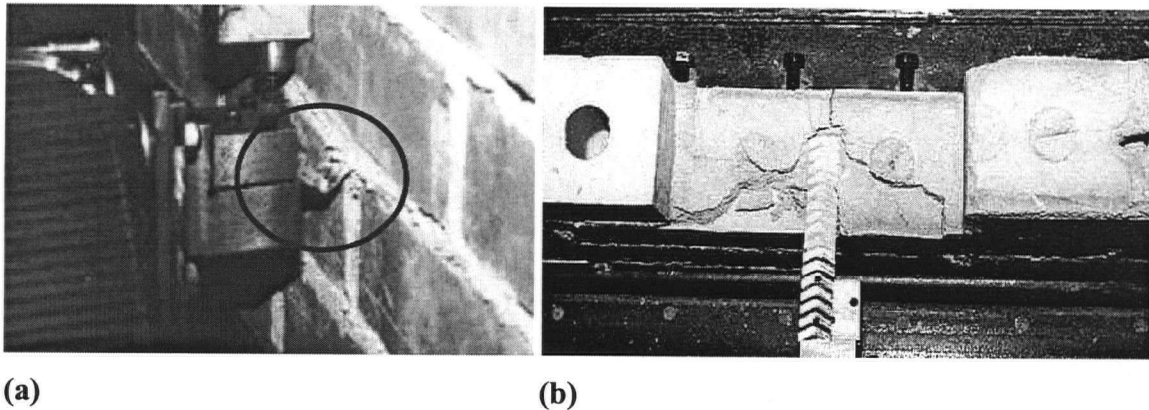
Photograph of failed specimens with corrugated strip tie (a) under reversed cyclic loading (buckling failure), (b) under monotonic loading.
